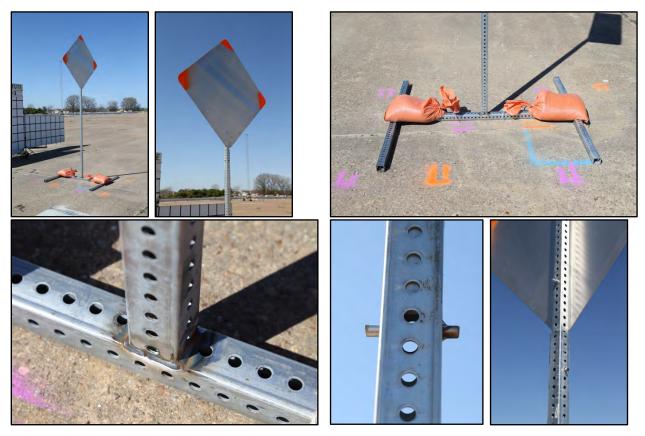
Option C Temporary Work Zone Sign Support Used for Test No. 490026-2-5.
